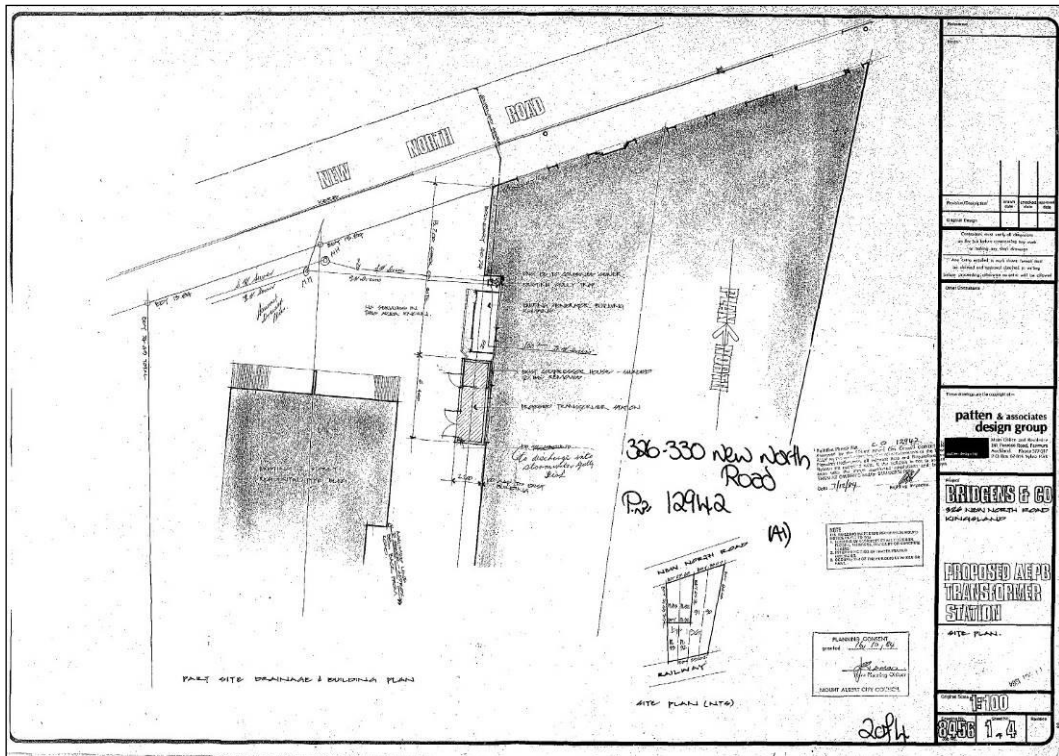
1984 Drawings for 'Proposed AEPB Transformer Station for Bridgens and Co 326 New North Road' - by Patten & Associates Design Group: Plans. Auckland Council Filenet. Accessed October 2016.
